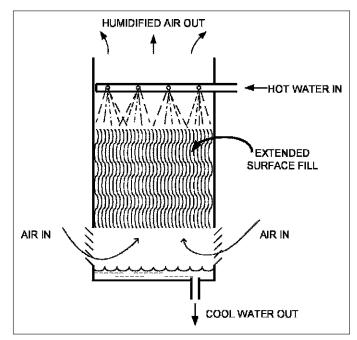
Typical Natural-Draft Open Cooling Tower
